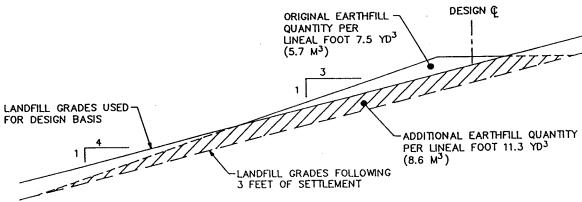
EFFECT OF SETTLEMENT ON ROAD DESIGN WITH SET HORIZONTAL AND VERTICAL CONTROL
